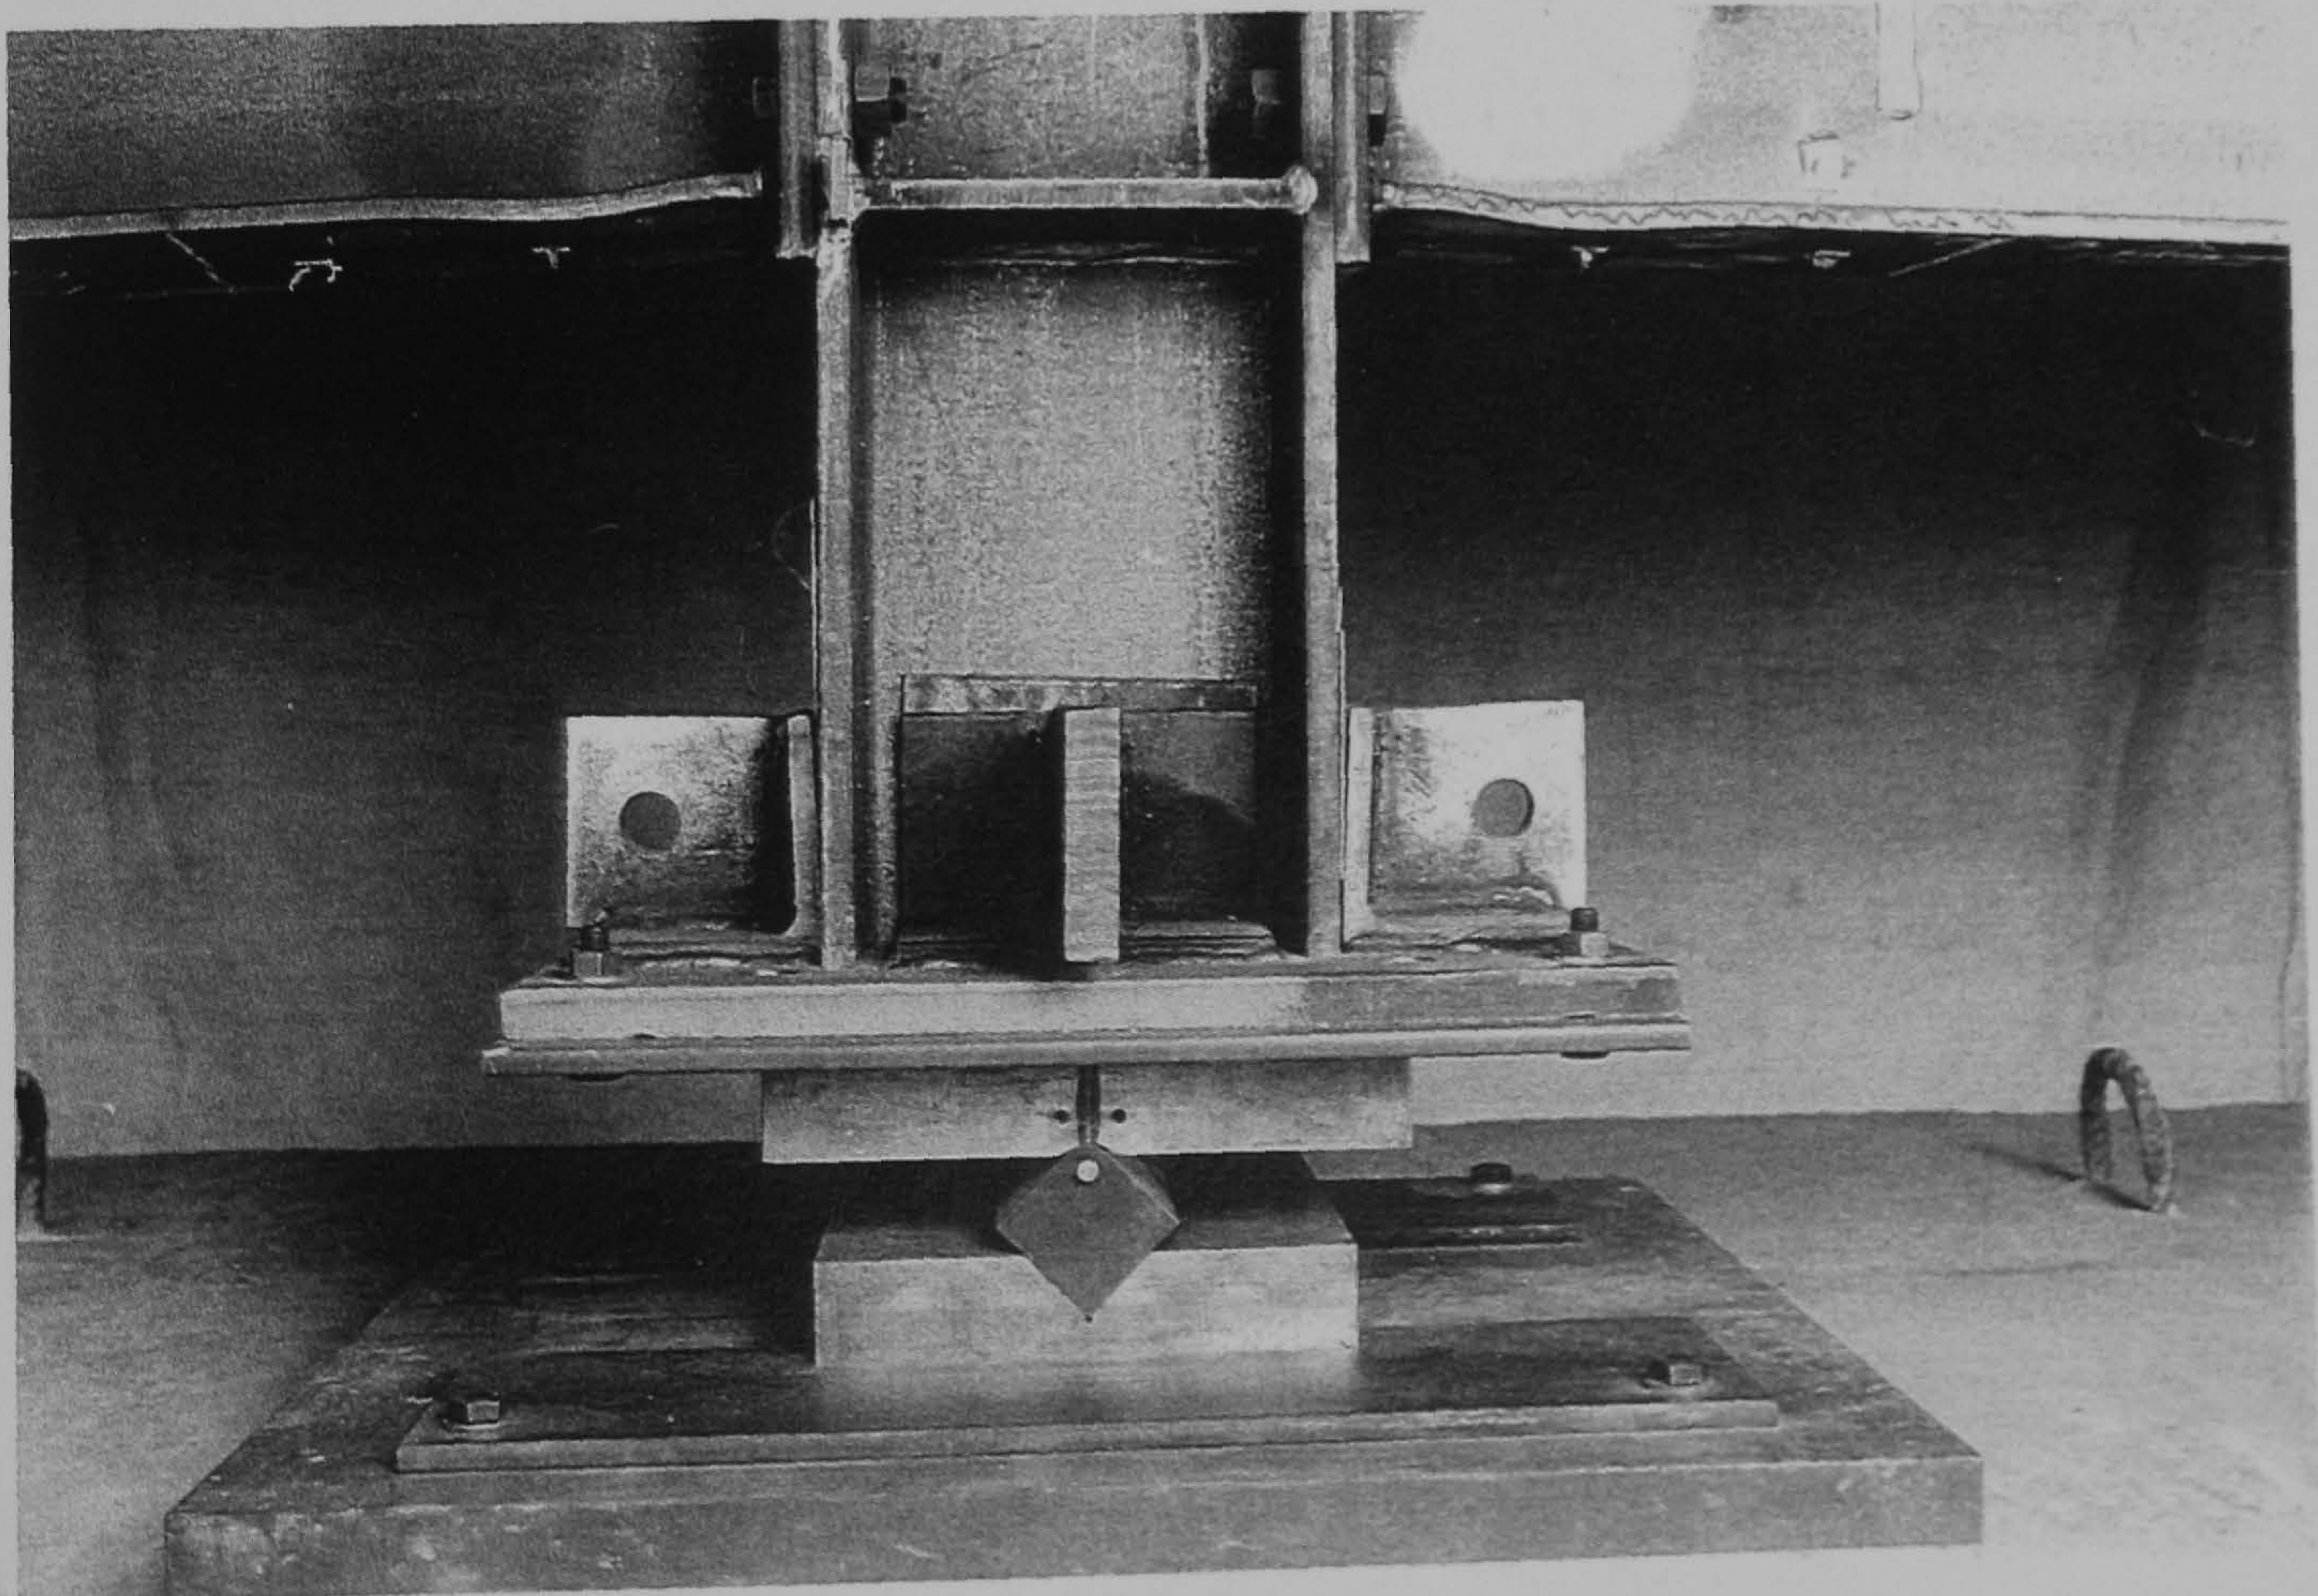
Uni-directional rocker column support used for tests 2, 3 and 5
